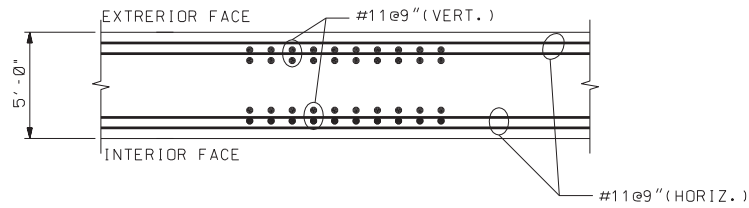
A-40 Reinforcement Arrangement of the AB MSIV House Wall (Section 1)
